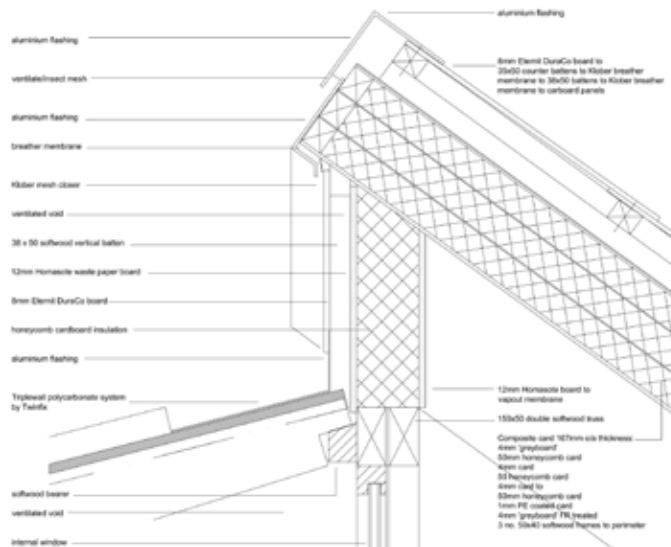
Westborough School, detail of connection between the wall and the roof panels at the ridge of the building, 2001
